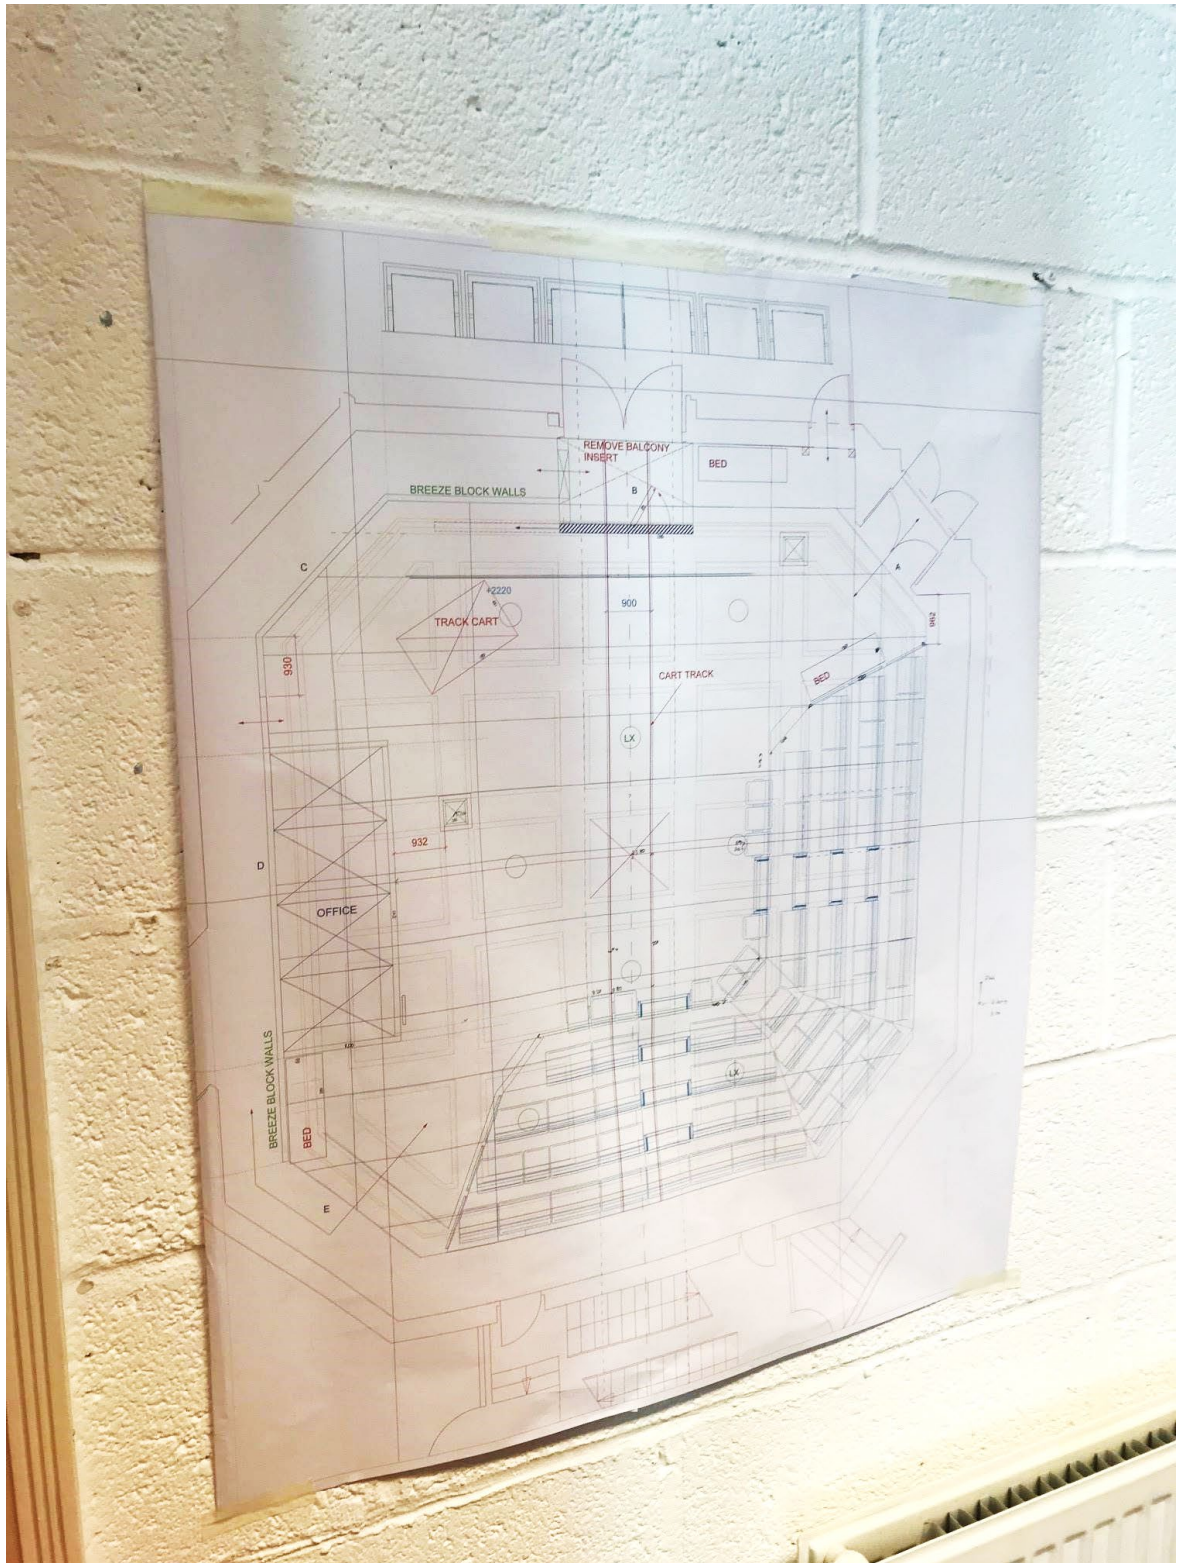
The groundplan on the rehearsal room wall at Out of Joint.
